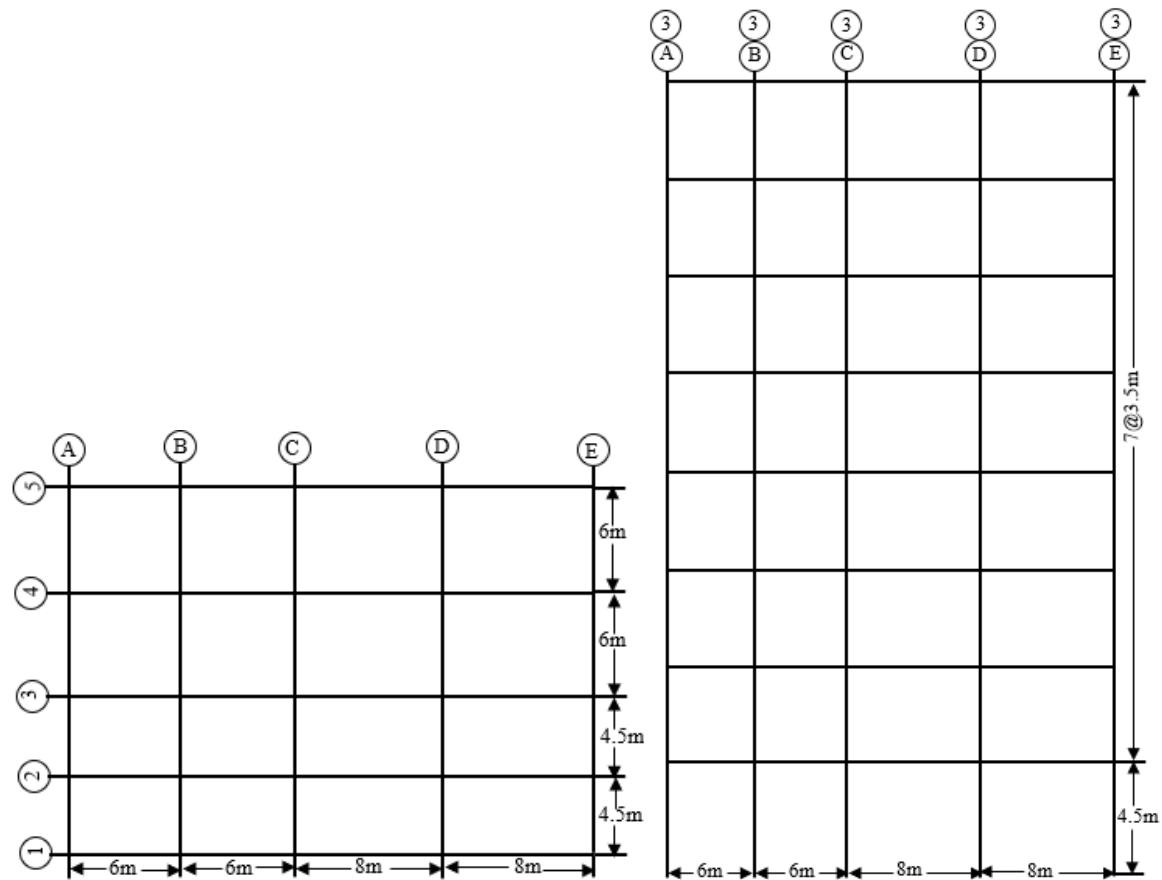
Floor plan of MI-8, MI-4, MI-1, and MI-S
